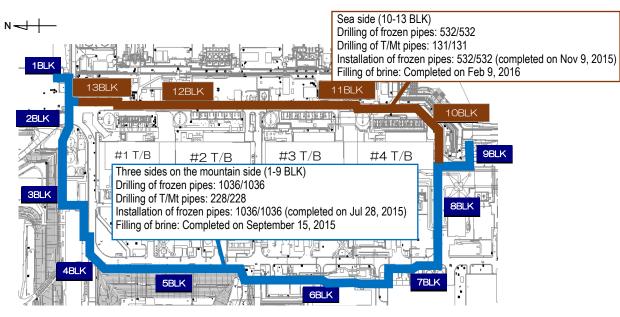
Drilling status for frozen-soil impermeable walls and installation of frozen pipes
